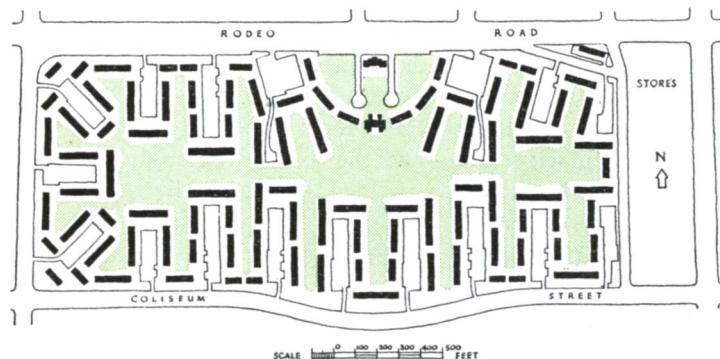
Plan of Baldwin Hills Village to the scale of the plan of New Town, Edinburgh
